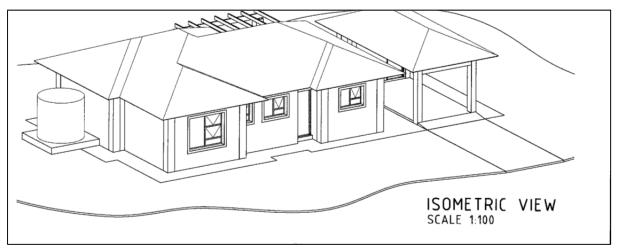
Typical design showing the type of houses that are being proposed by Transnet
